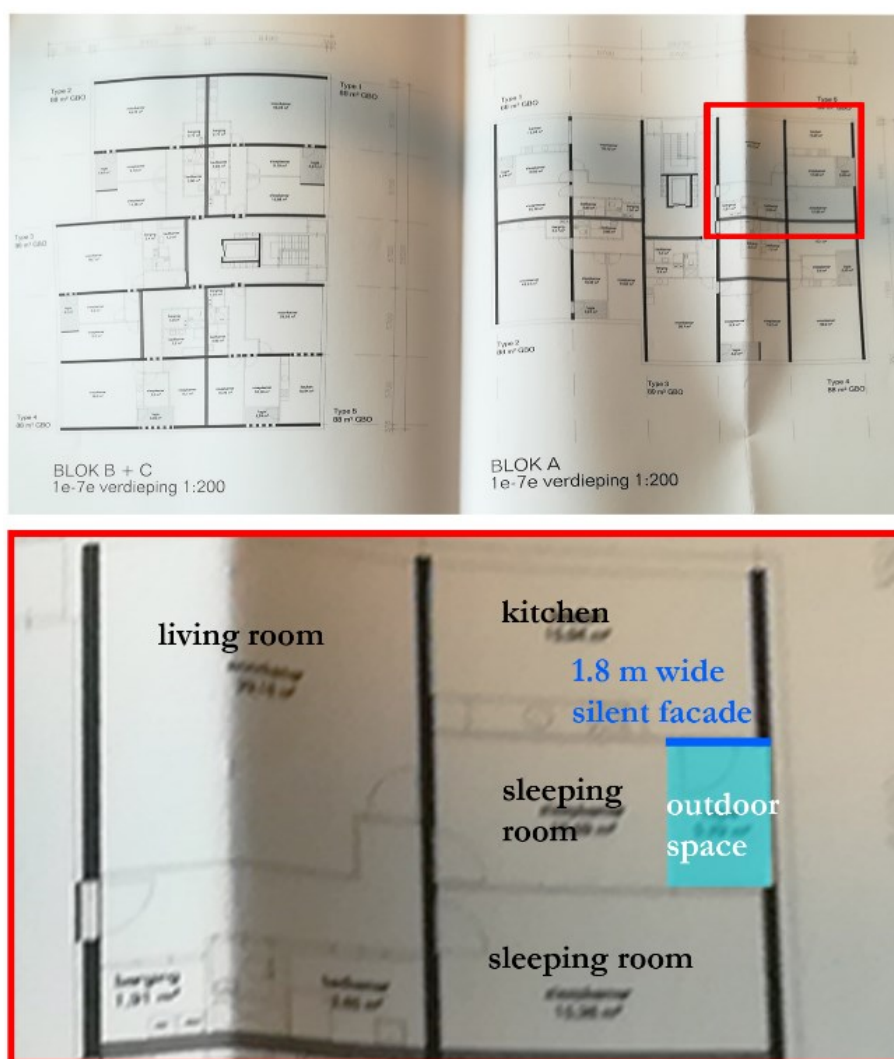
floor plans on 14th December 2009. The zoom marked in red focus on one flat, indicating the quiet outdoor space (light blue area), and the silent façade (blue line) towards which the living room is faced (elaboration of the author on drawings provided by the acoustic consultant).
